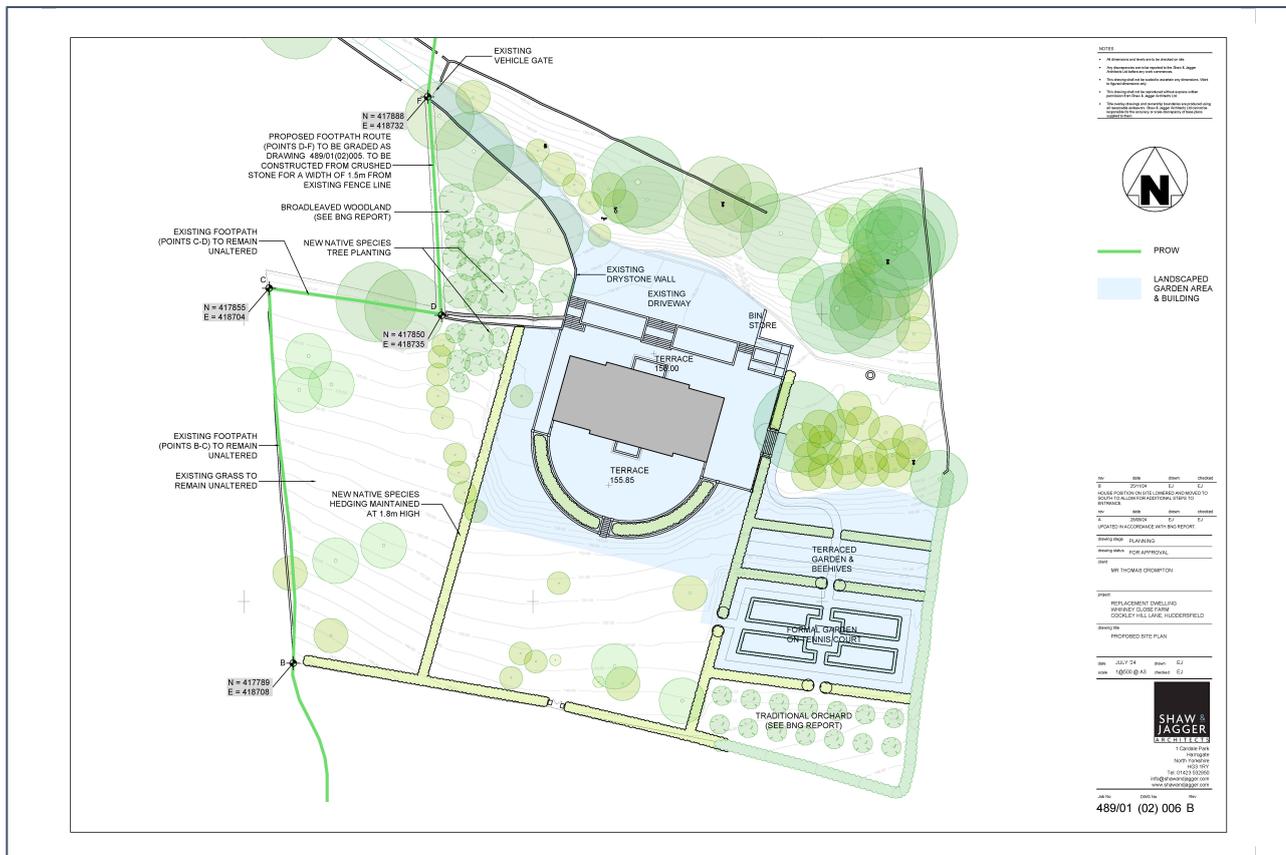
Proposed site layout. Shaw & Jagger Architects Ltd., July 2024.
